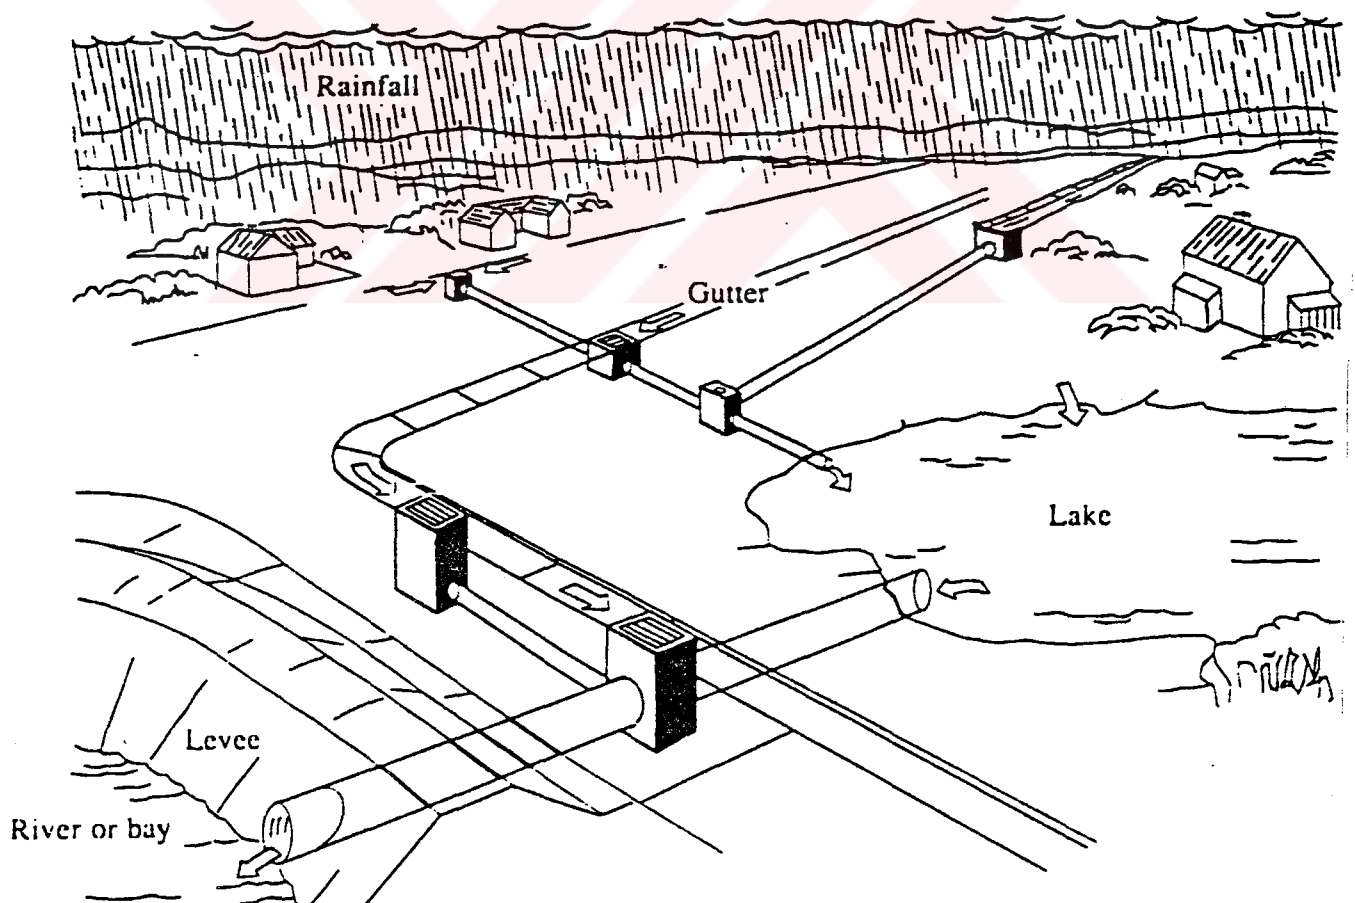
Typical Urban Drainage System (Chow et al., 1988)
